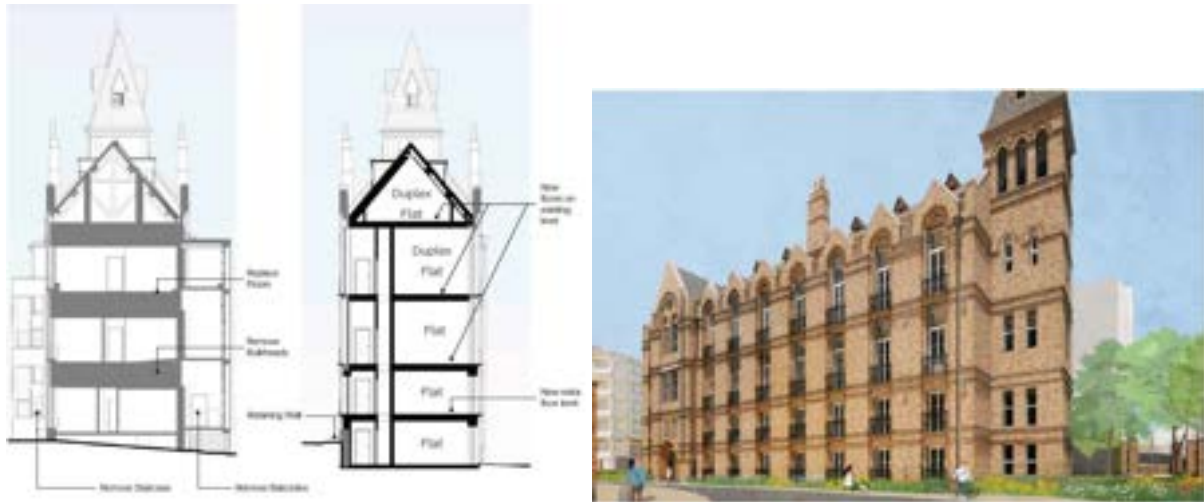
Charterhouse: Existing and proposed sections (left) and visualisation of proposed southern elevation
